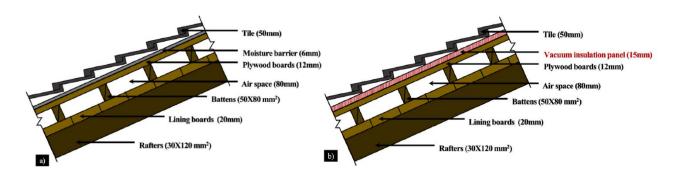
Wooden roof layer in historic building case, a) Before applying retrofit technology, b) After applying retrofit technology. (Taken from Historic building energy conservation with wooden attic using vacuum insulation panel retrofit technology)
